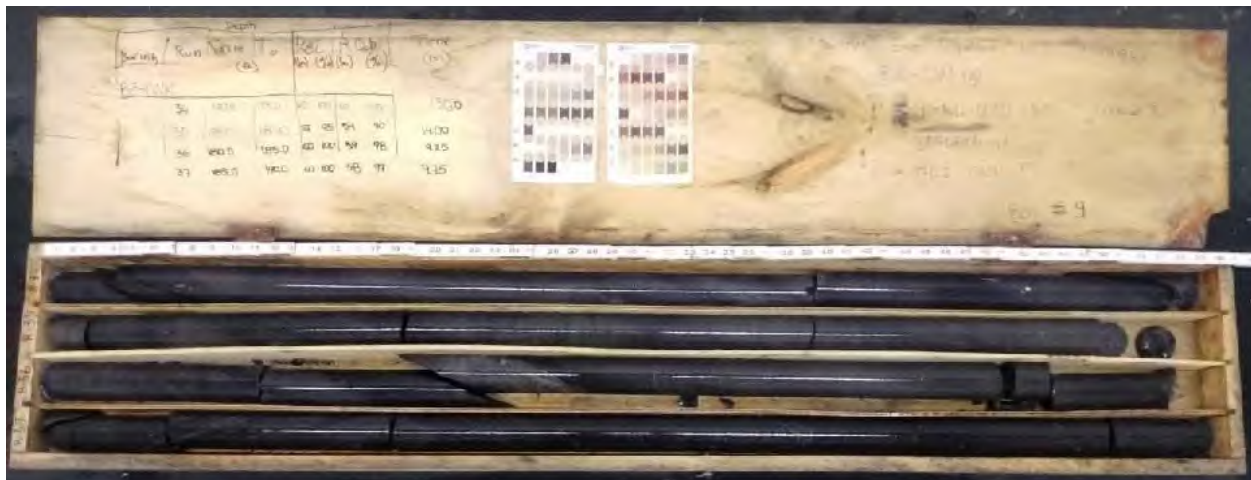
B3-1W, Samples C-22 to C-24 (110 to 130 feet)
